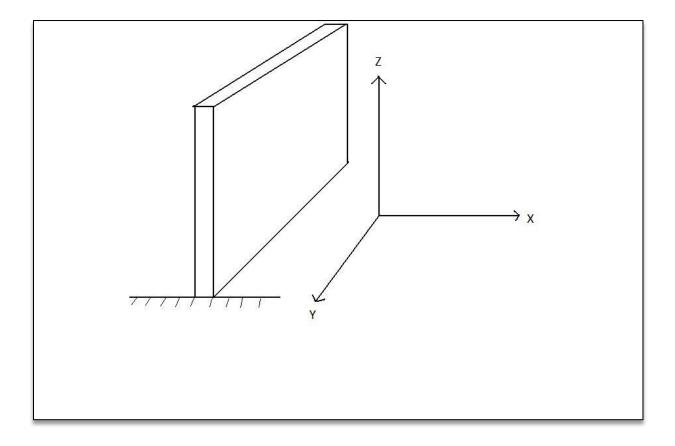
Plane (x,y,z) directions in backfill soil behind a gravity retaining wall
